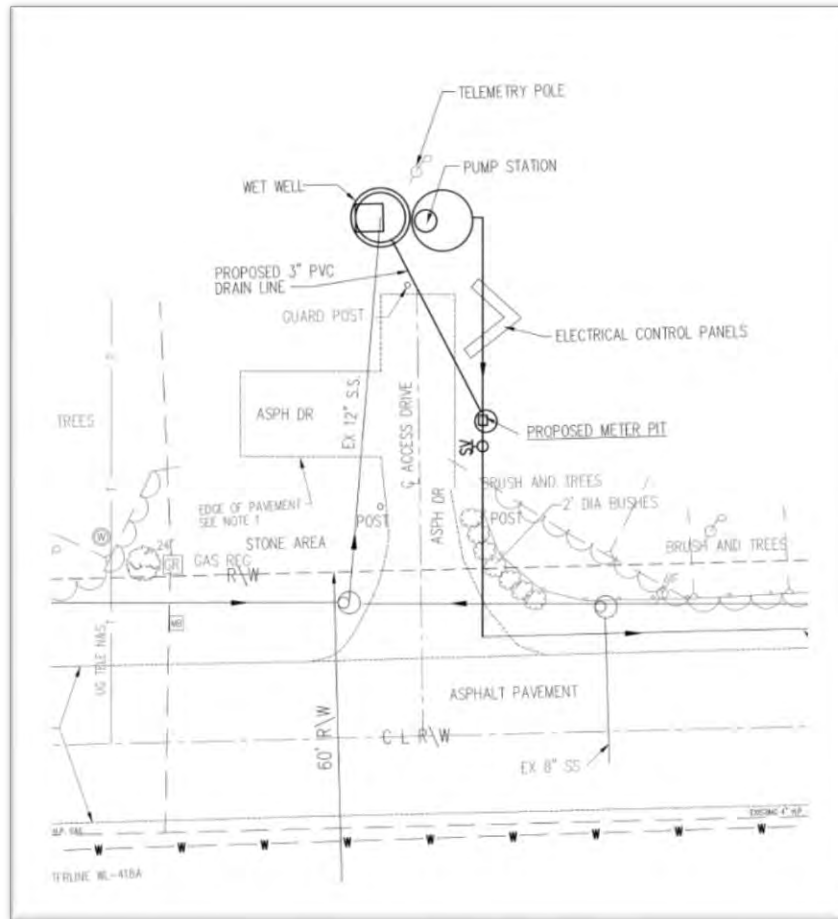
Site Plan from Willowbend Pump Station Improvements, SS#307,
